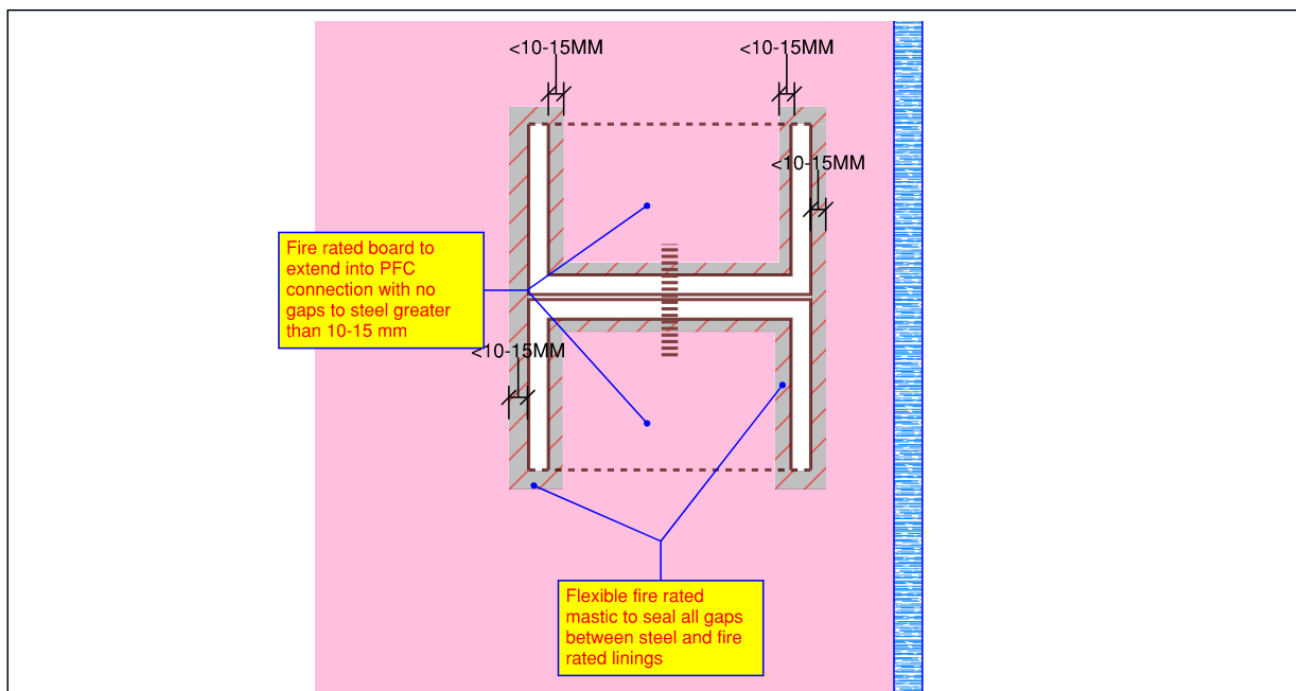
Steel header beam locations penetrating fire rated lining – Basement 1
